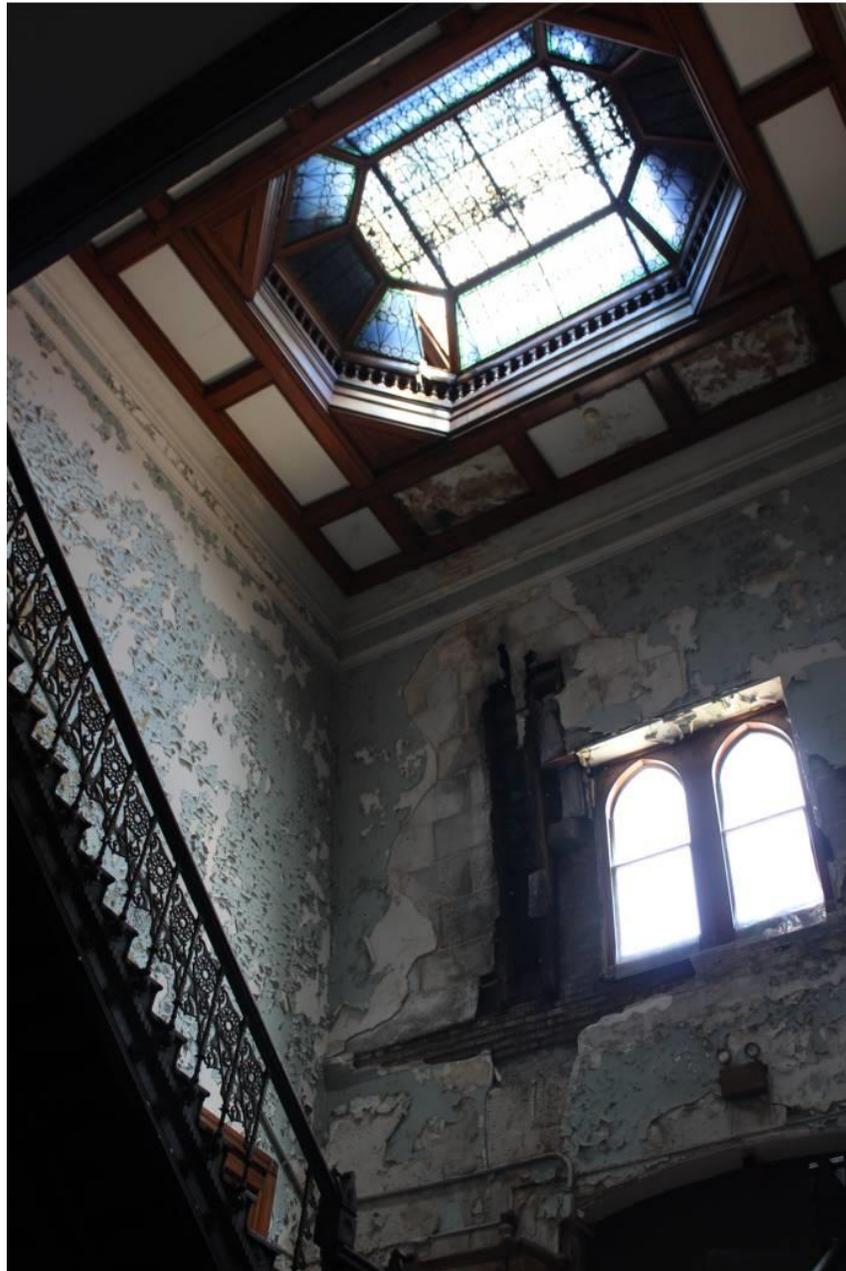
Deteriorated Mansard Roof Framing at Skylight
